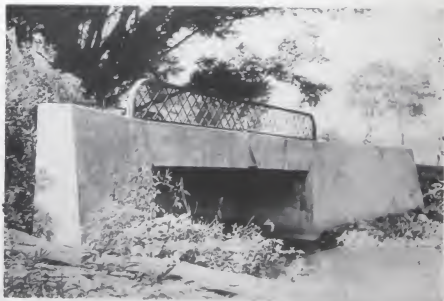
Flat Top Concrete Bridge with ornamental iron guard rail, near Geneva, Illinois.
